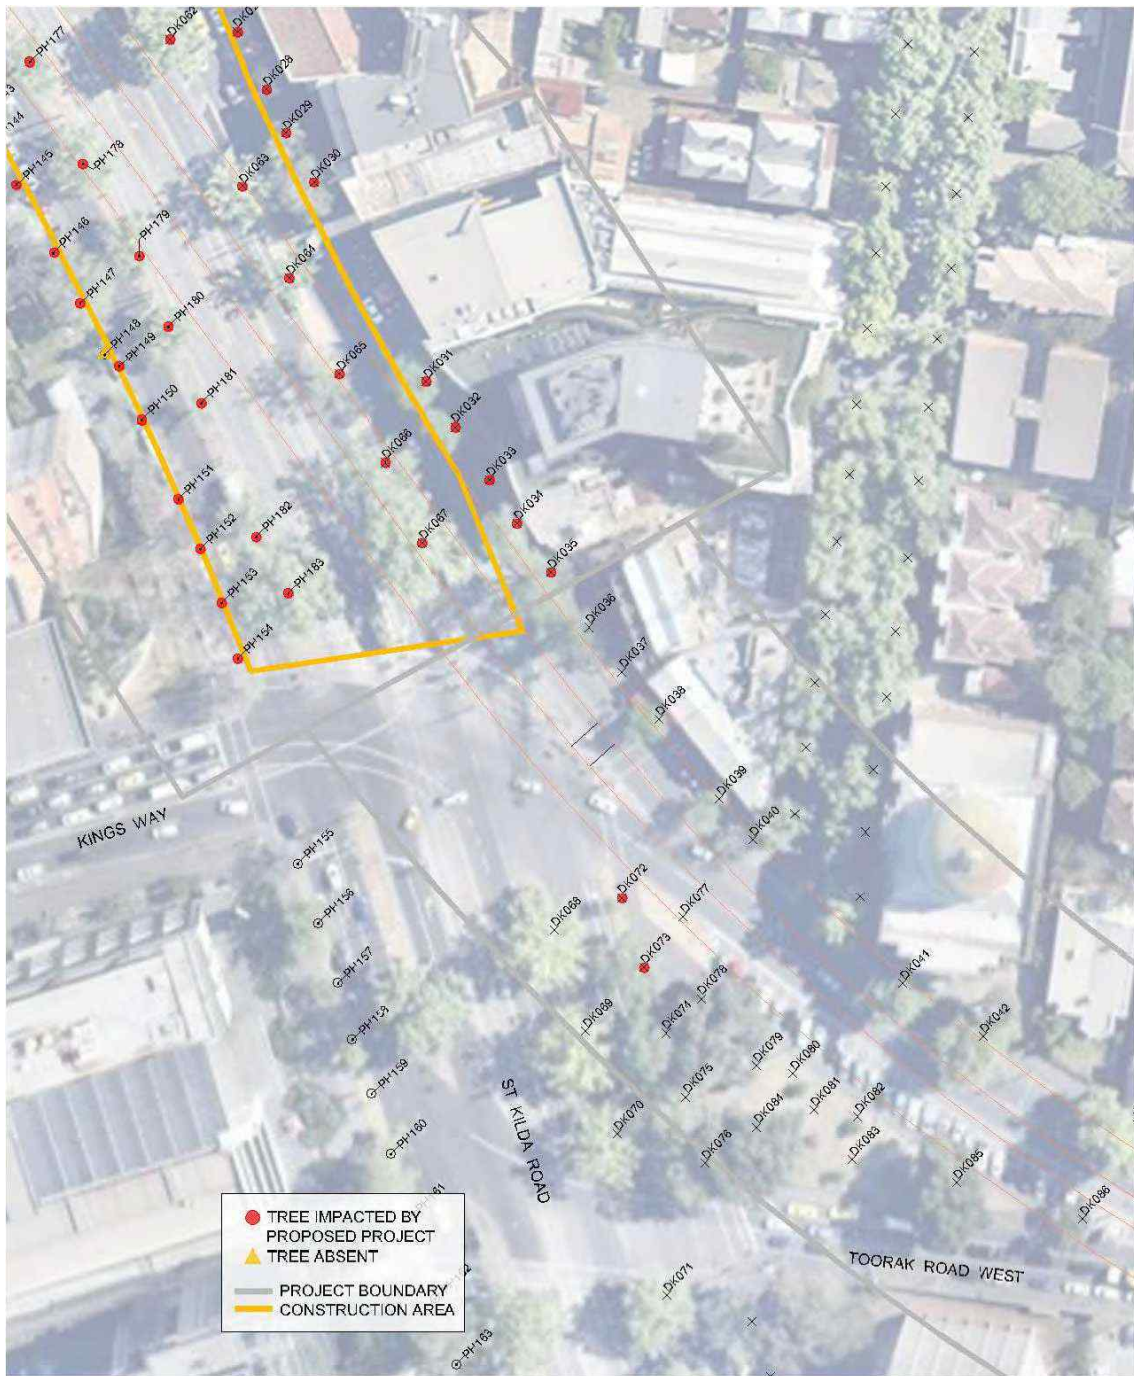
Proposed tree removals in St Kilda Road road reserve section 4, note that trees DK072 and DK073 are addressed in the early works section of this report (Section 16.5.7)
